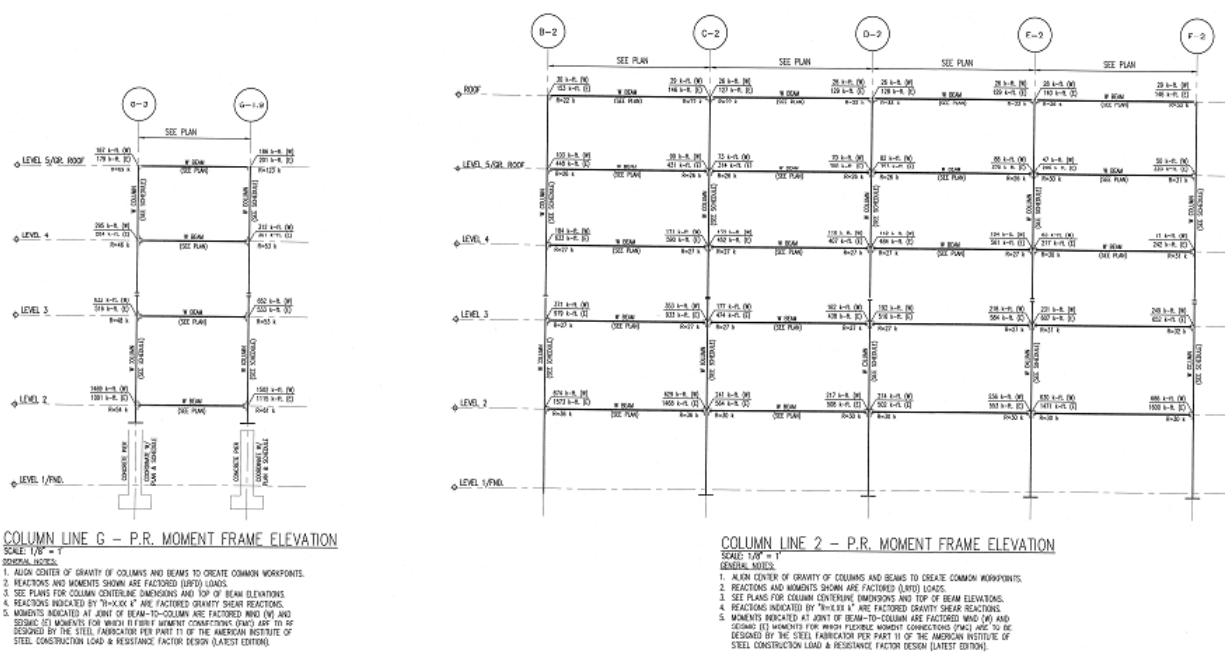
P.R. Moment Frame Elevations (G and 2)
